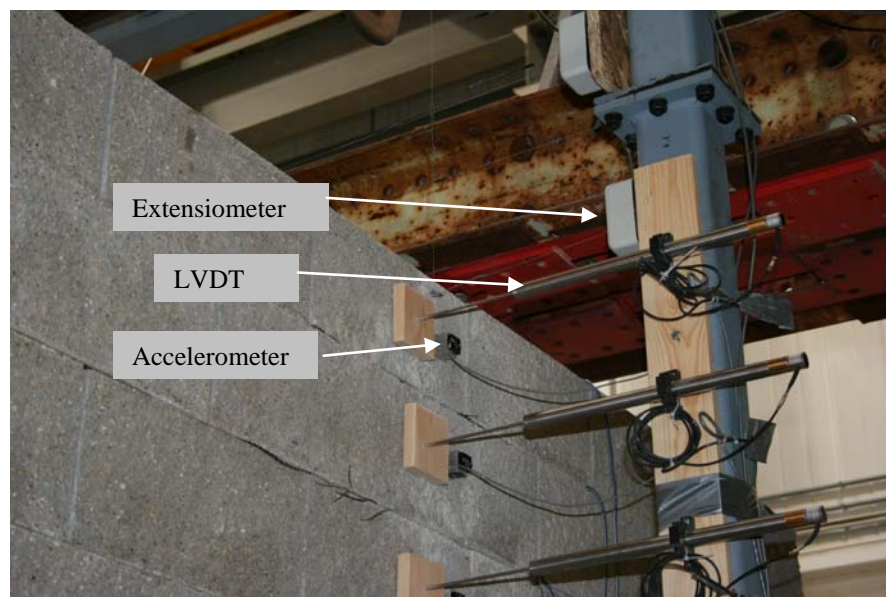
Instrumentation Close-up: LVDTs, Accelerometers, and Extensometers
